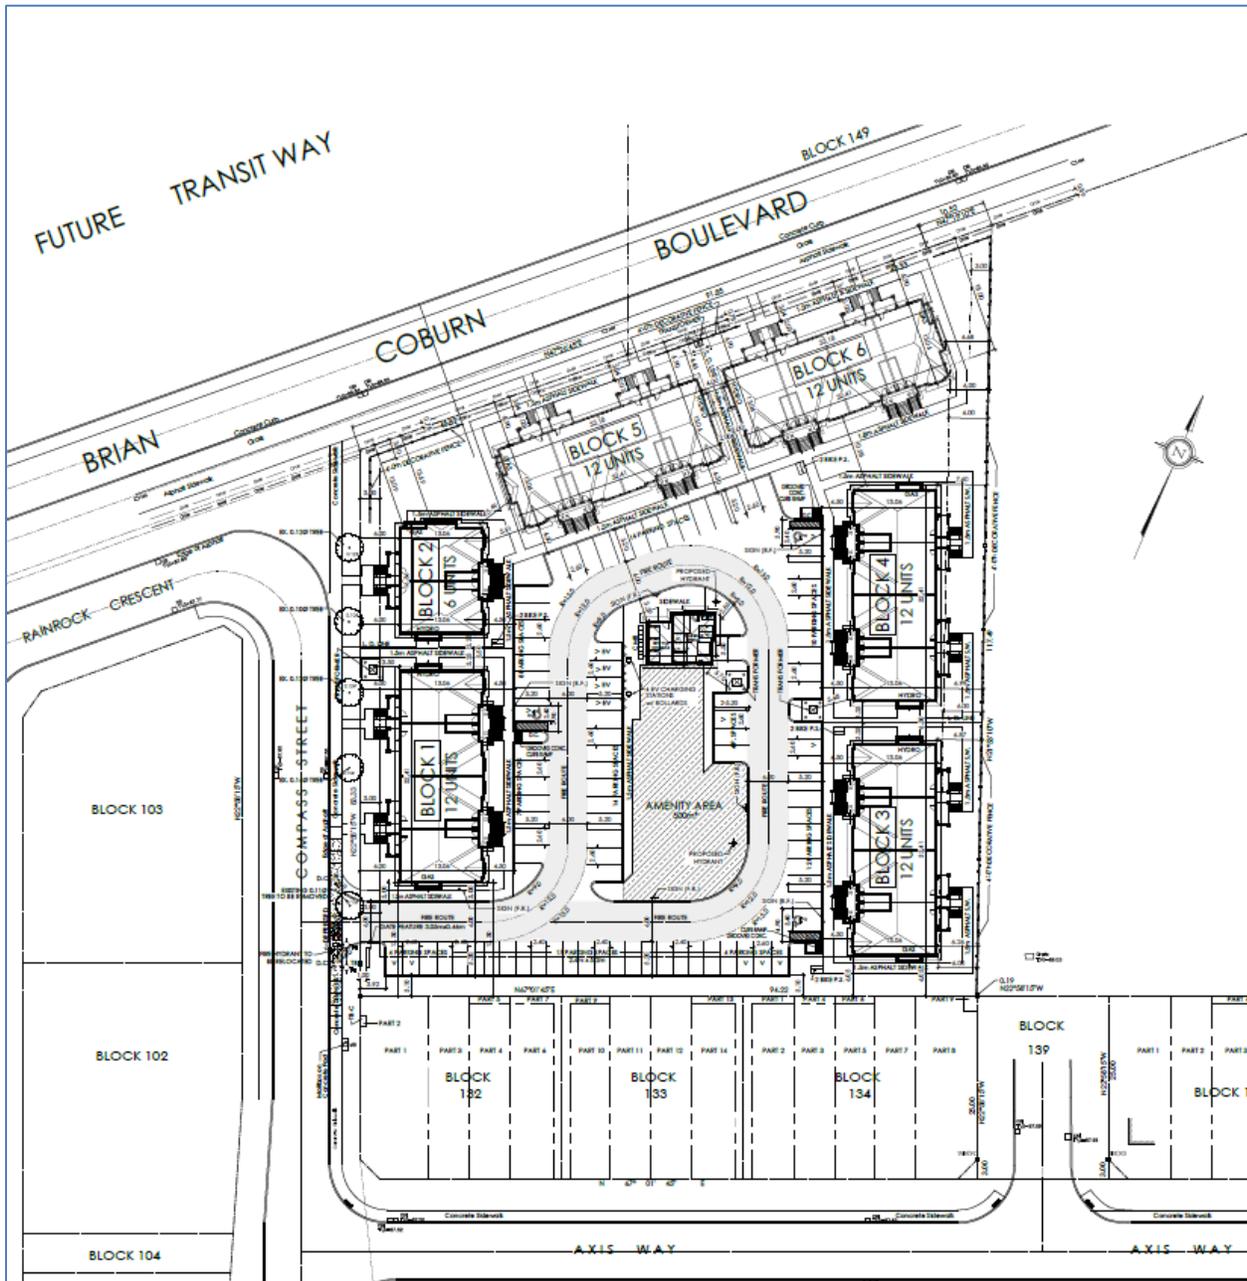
Proposed site plan showing a planned unit development of six stacked dwelling buildings with a total of 66 units plus associated parking and amenity area. A [PDF version of the site plan](#) is available on the Development Applications Search Tool (Ottawa.ca/Devapps).
